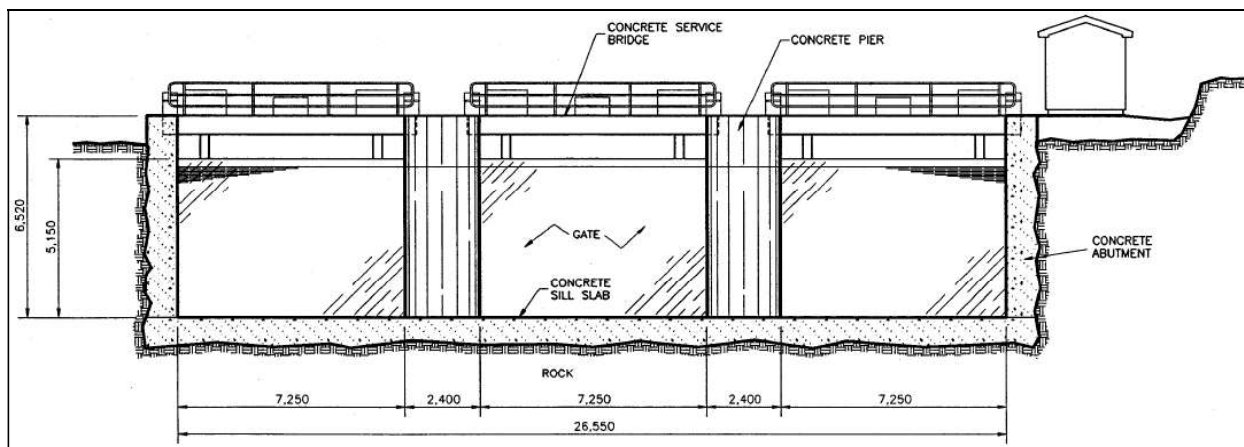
General arrangement of Portage Dam, view looking downstream. Gate #1 at right.
